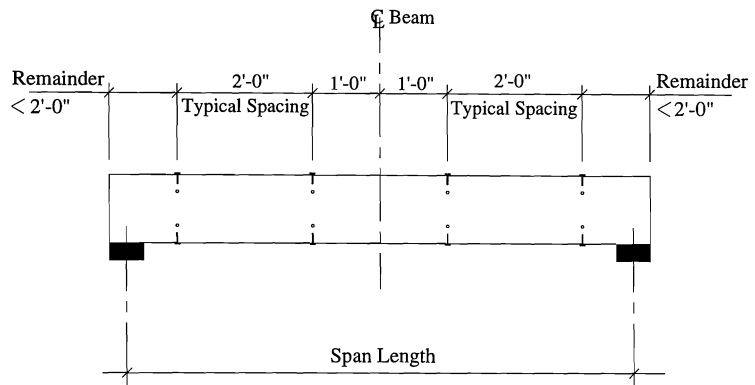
Typical Screw Spacing for Solid Web Test Specimens (1-foot = 305 mm)
